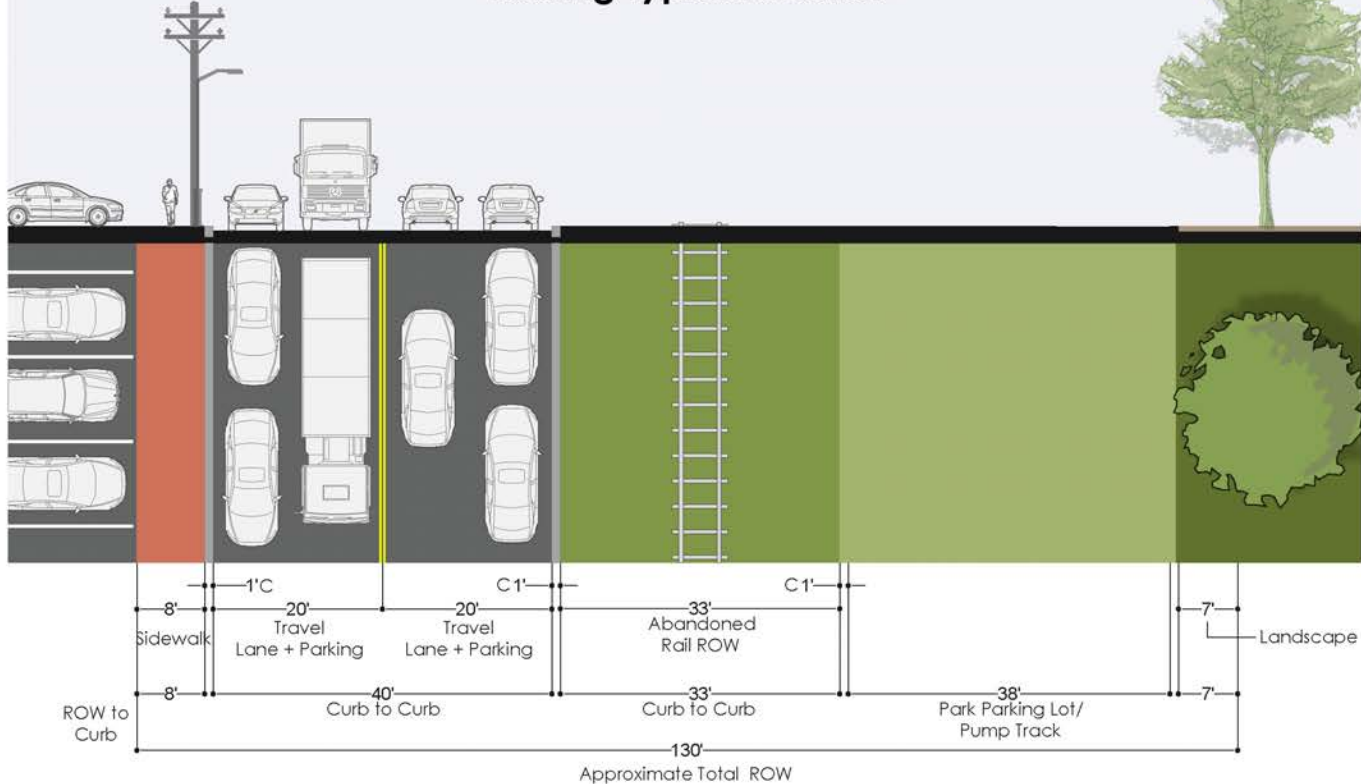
Existing Typical Section - 4th Street to 9th Street
